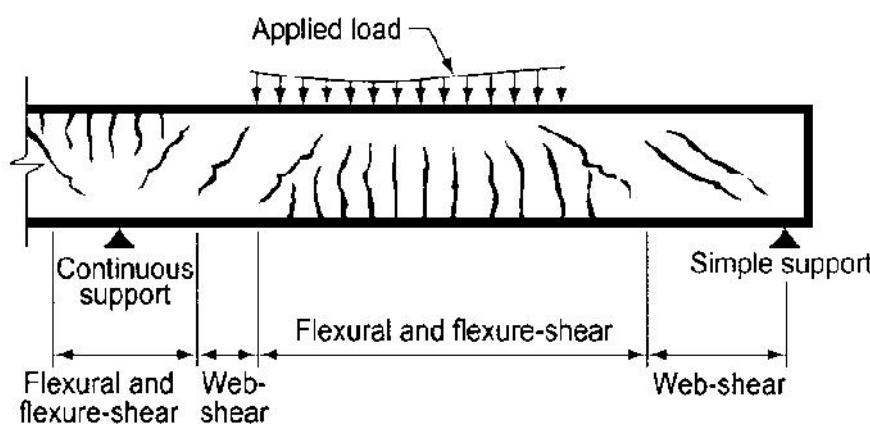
Types of cracking in concrete beams.
